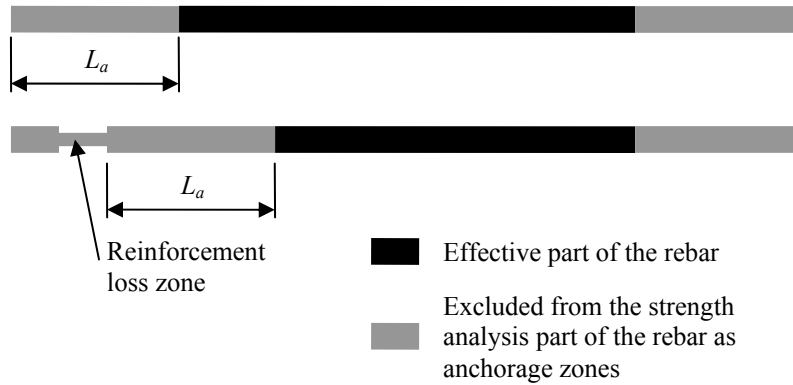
Modification of rebar anchorage zone as a consequence of the corrosion effect – reinforcement loss
